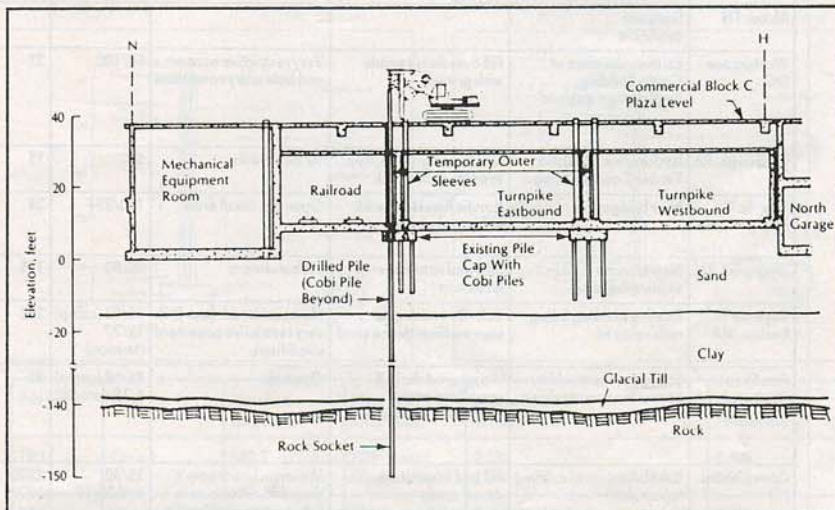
Section through the turnpike and railroad right of way, and the mechanical equipment room, showing minipile installation through 16" diameter temporary outer liners. Hynes Auditorium (Johnson and Schoenwolf, 1987).
